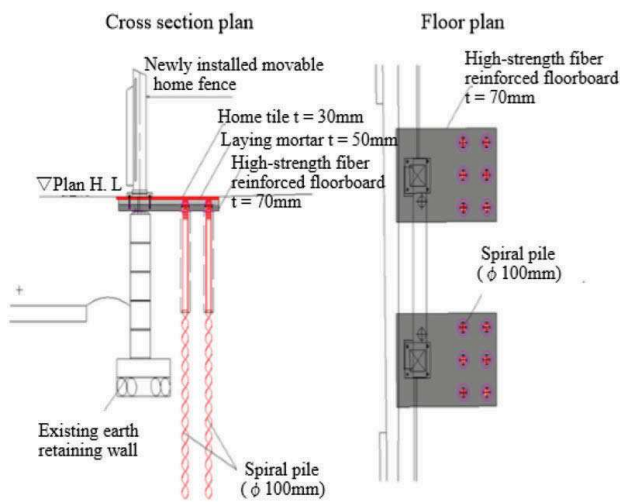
Example of foundation structure using spiral piles and high-strength fiber reinforced floorboards (Platform door foundation on embankment type platform) (Nonaka et al. 2019).
